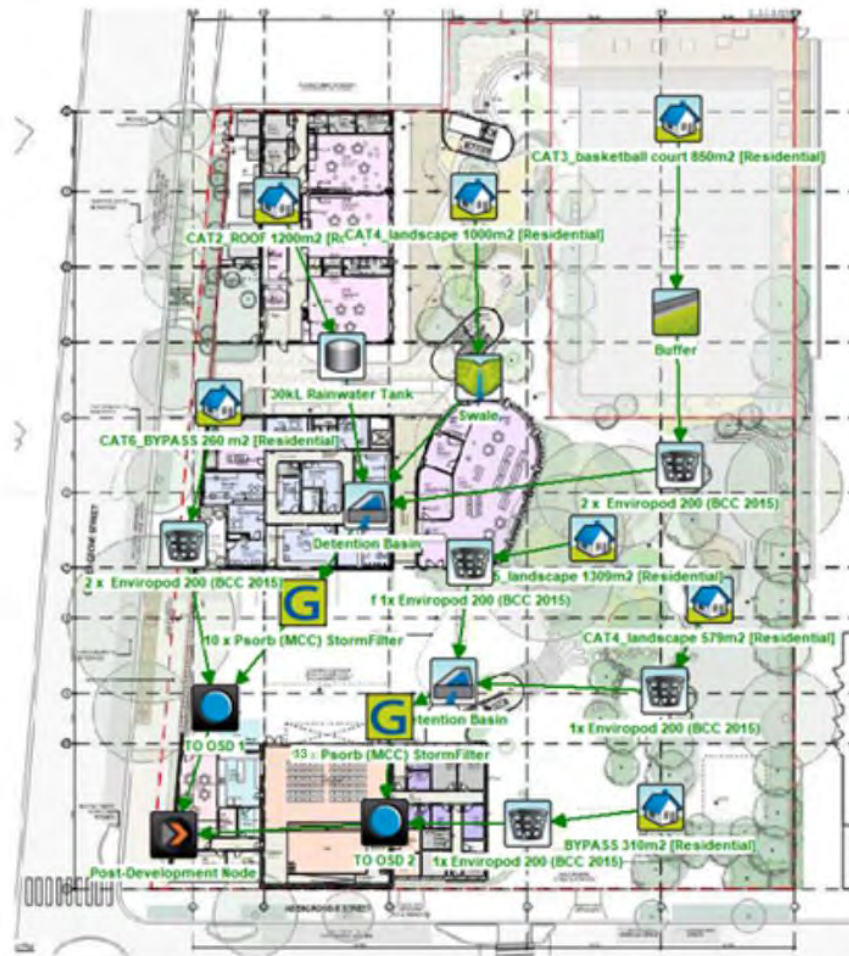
MUSIC Modelling Layout (Background on Architectural Plan Issued 01.05.2020)
